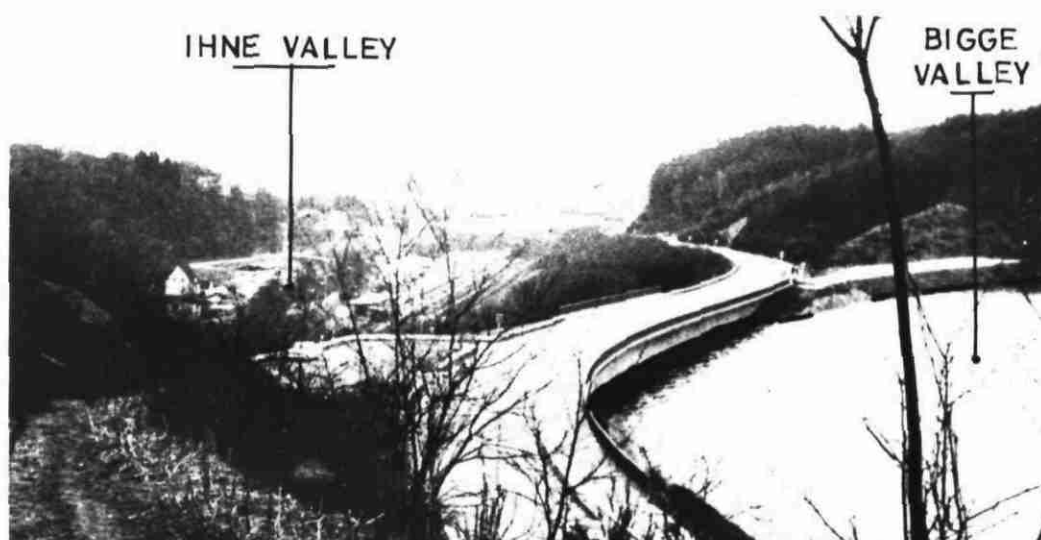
View of the ridge "Kraghammer Sattel" at the Bigge damsite, West Germany
